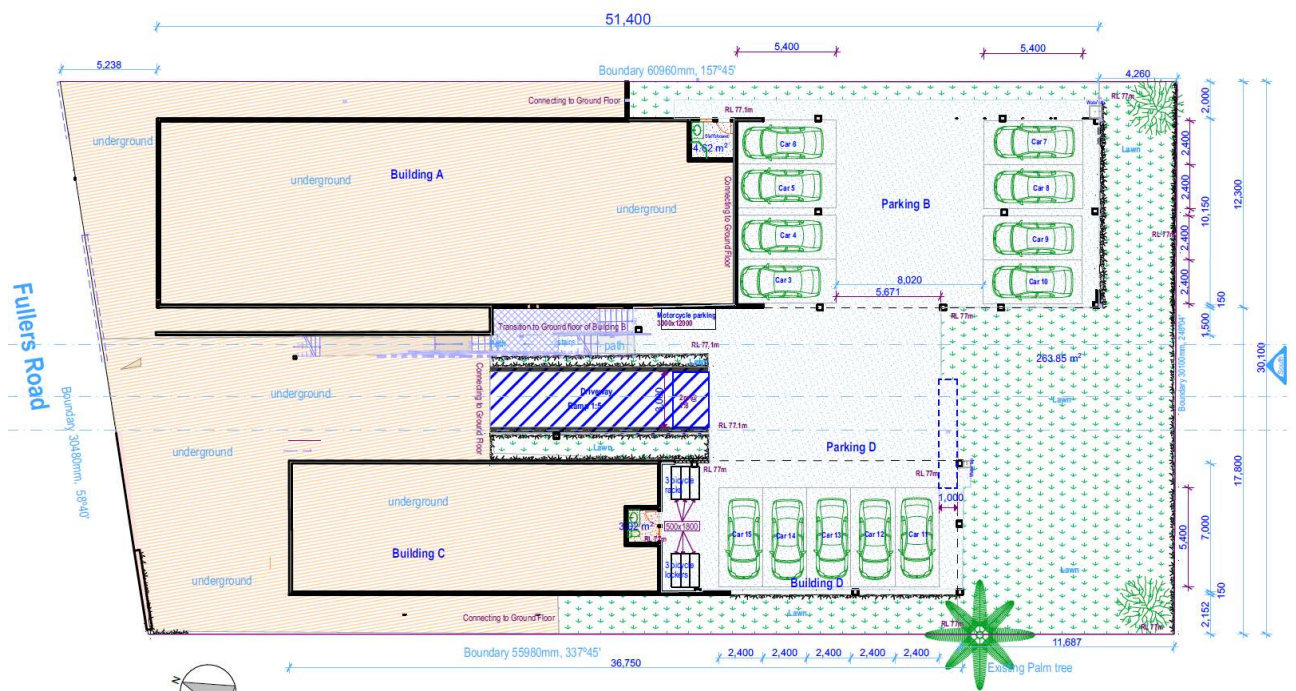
Lower Ground Floor plan (Source: SCC Report, J Yang).
